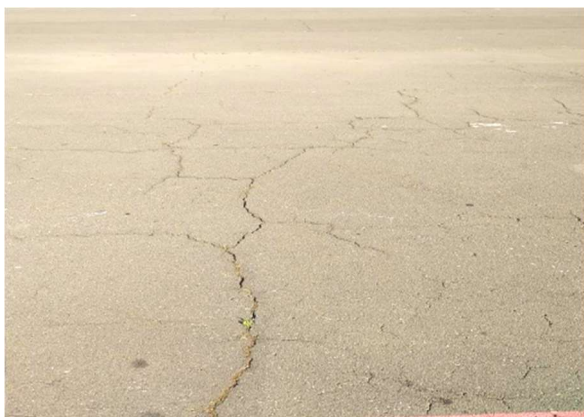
The "Mykolayiv International Airport" apron pavement crack grid
